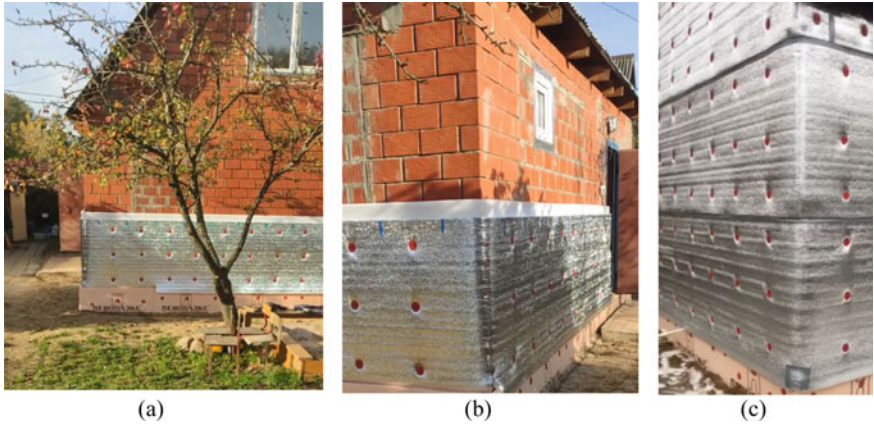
Insulation with rolled polyethylene: a - the facade of the building, b - the corner of the building; c - finished insulating shell
